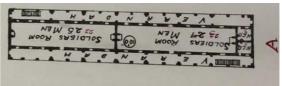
1913 1/F Plan, extracted from the 1913 Whitfield Barracks Skeleton Record Plan, sheet 3/3 (Source: TNA WO78#3744)
